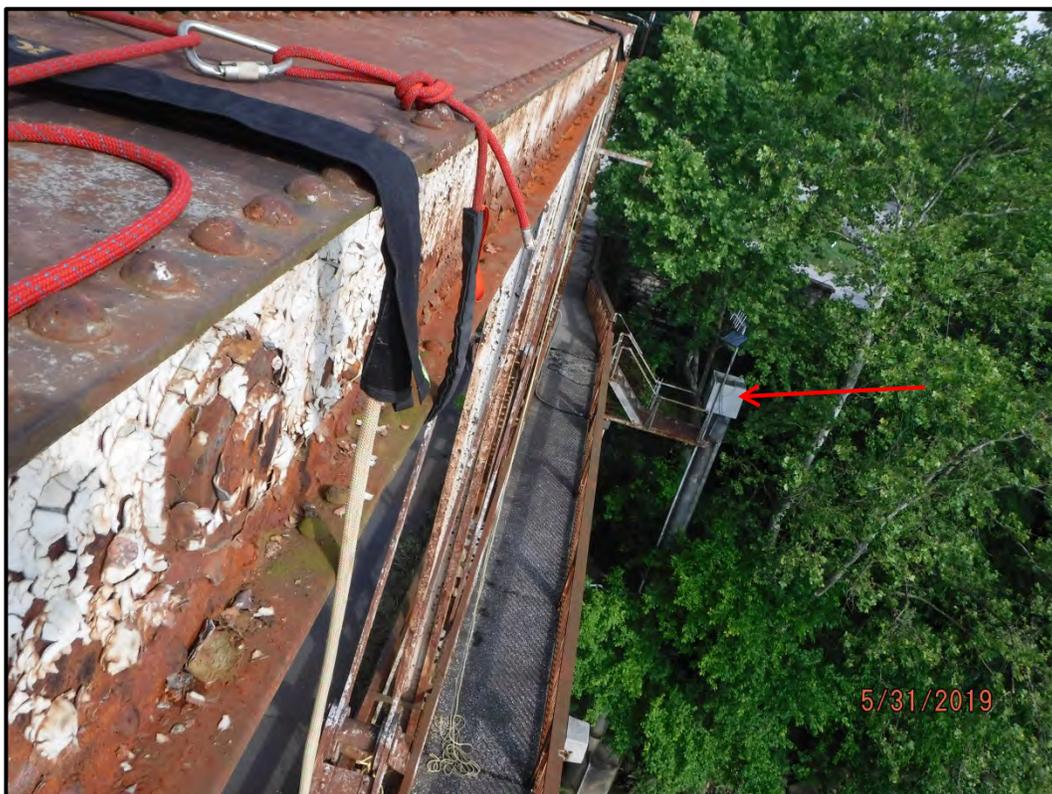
The USGS station adjacent to Pier 6 has access coming from the Broadway Bridge sidewalk.
